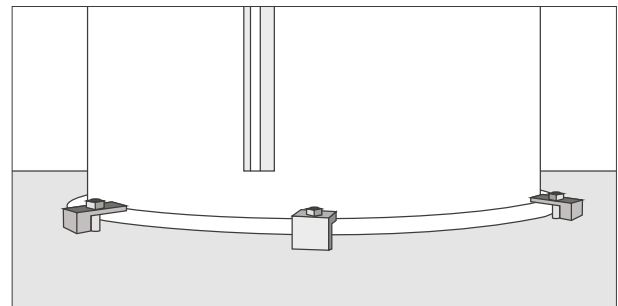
Anchoring brackets are evenly distributed around the anchoring foot.
